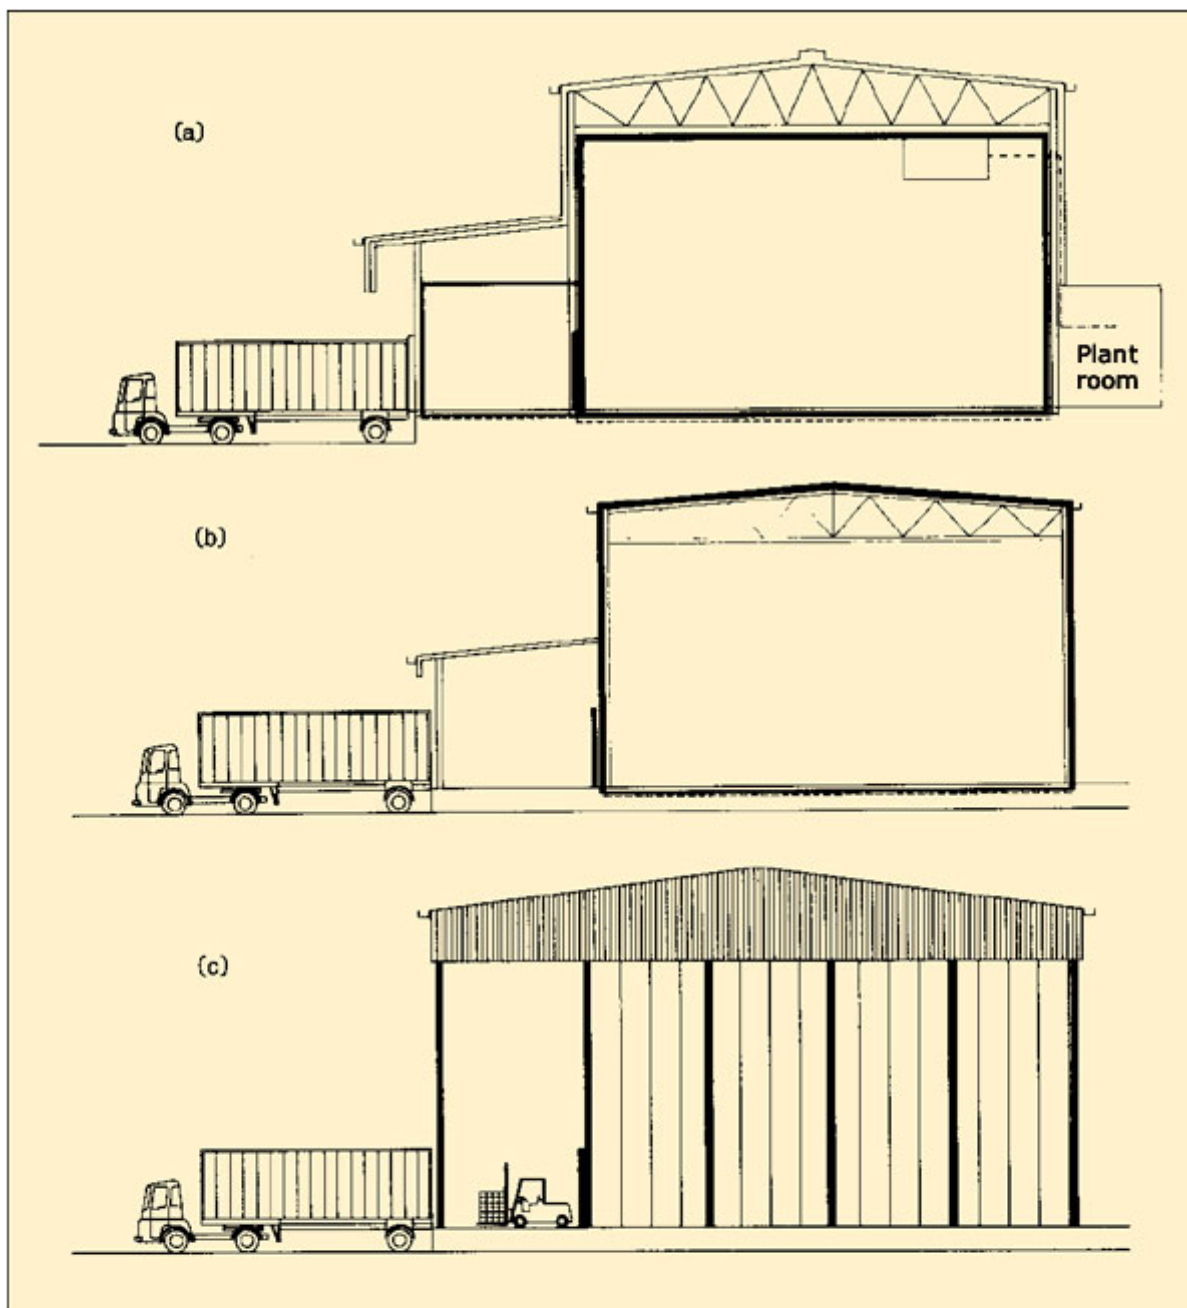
Types of insulation: (a) internal insulation systems with external wall and roof cladding; (b) external insulation system; and (c) internal insulation system with roof and partial external wall cladding
